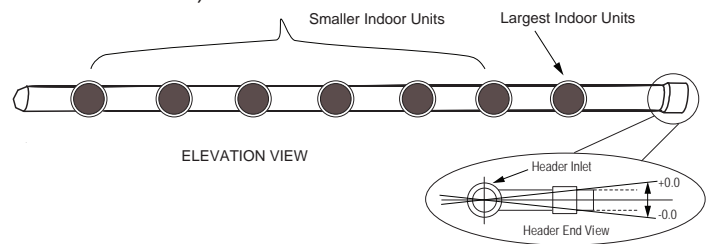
Vertical Header Insulation and Piping Detail (Ports Must Point to an Upright Direction).
